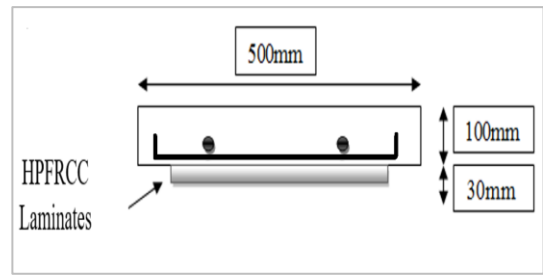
Cross-section of the slab reinforced with HPFRCC Laminates
